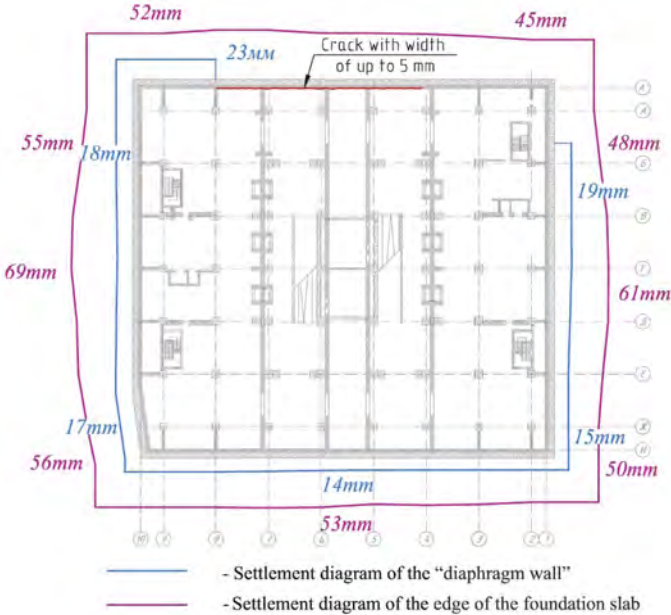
Deformation diagrams of the edge of the foundation slab of the constructing building and the adjacent “diaphragm wall”.
